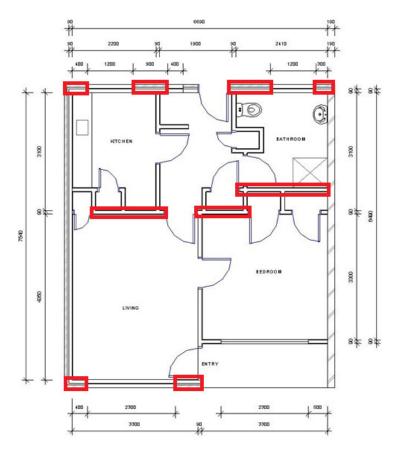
Walls used for bracing in the longitudinal direction, Blocks A-C.
